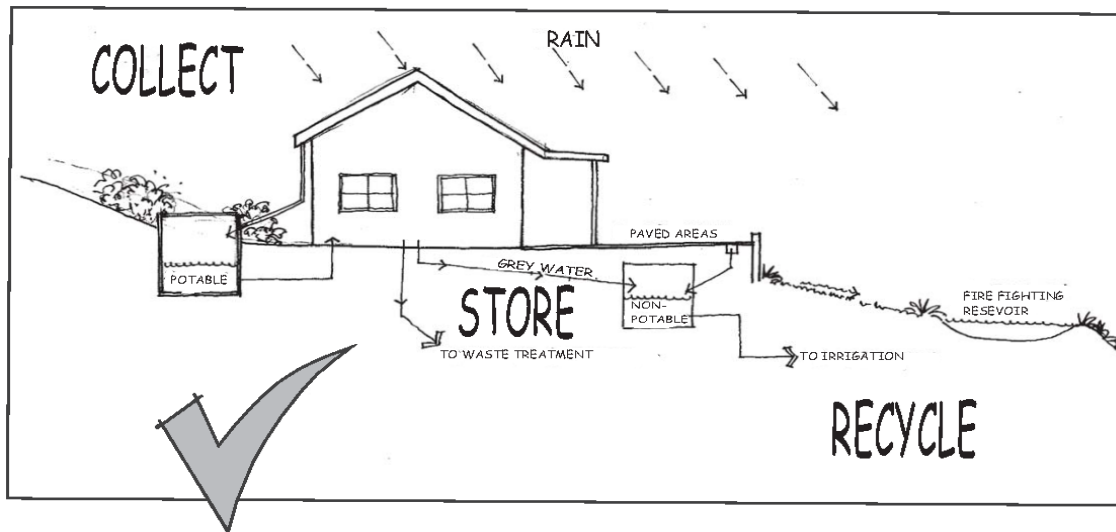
On-site Water Storage, Efficient Use and Re-cycling
